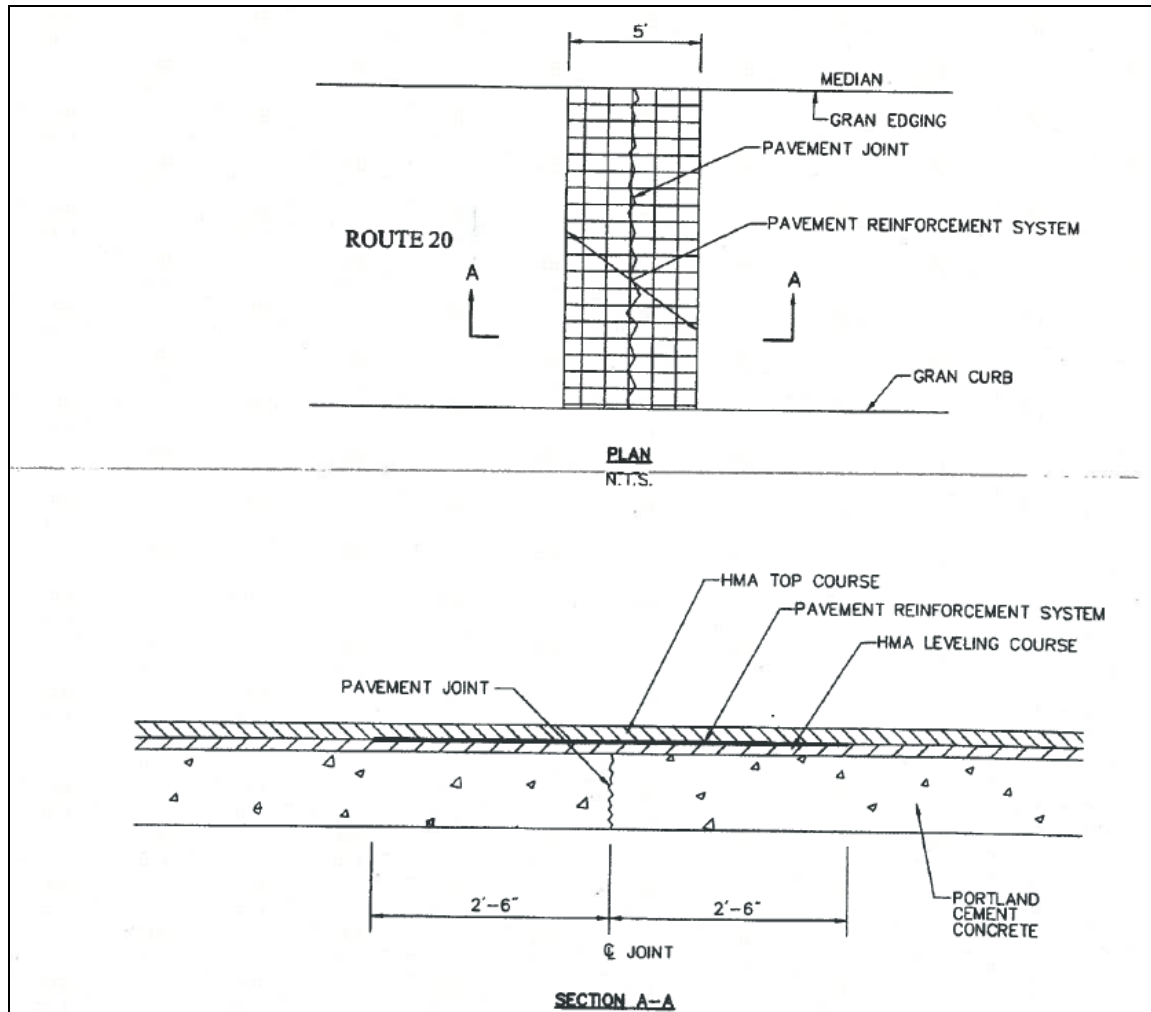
P6 typical section detail, Route 20 (Washington St.) Auburn
